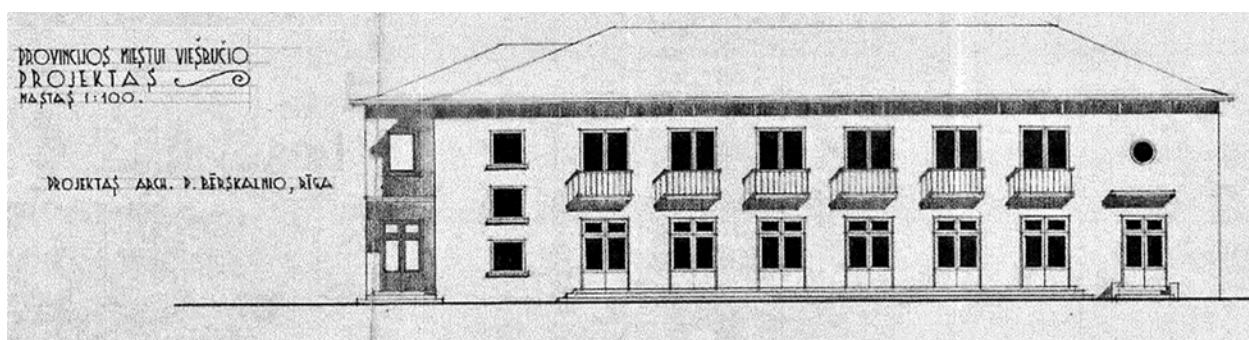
Design project of a standard masonry provincial hotel building for construction in Lithuanian cities and towns (arch. Pēteris Bērskalns, c. 1937) [Drawing from Lithuanian Central State Archives].
